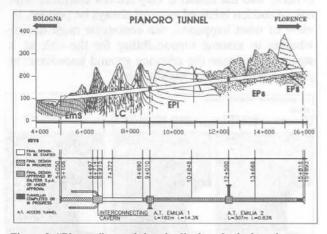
"Pianoro" tunnel: longitudinal geological section.
